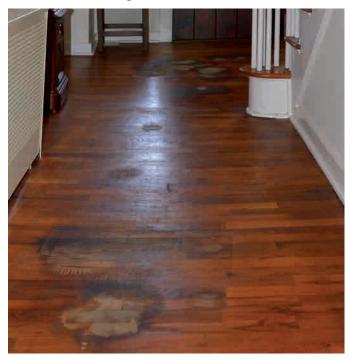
Detail of Flooring at Stair Hall (Room 101), Detail of Pet Staining
